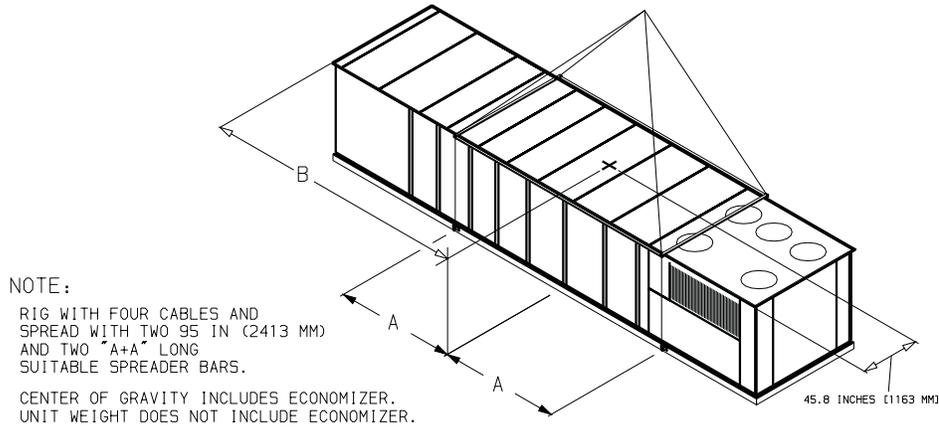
Rigging Label — Size 055-105 Units (Standard Chassis)
